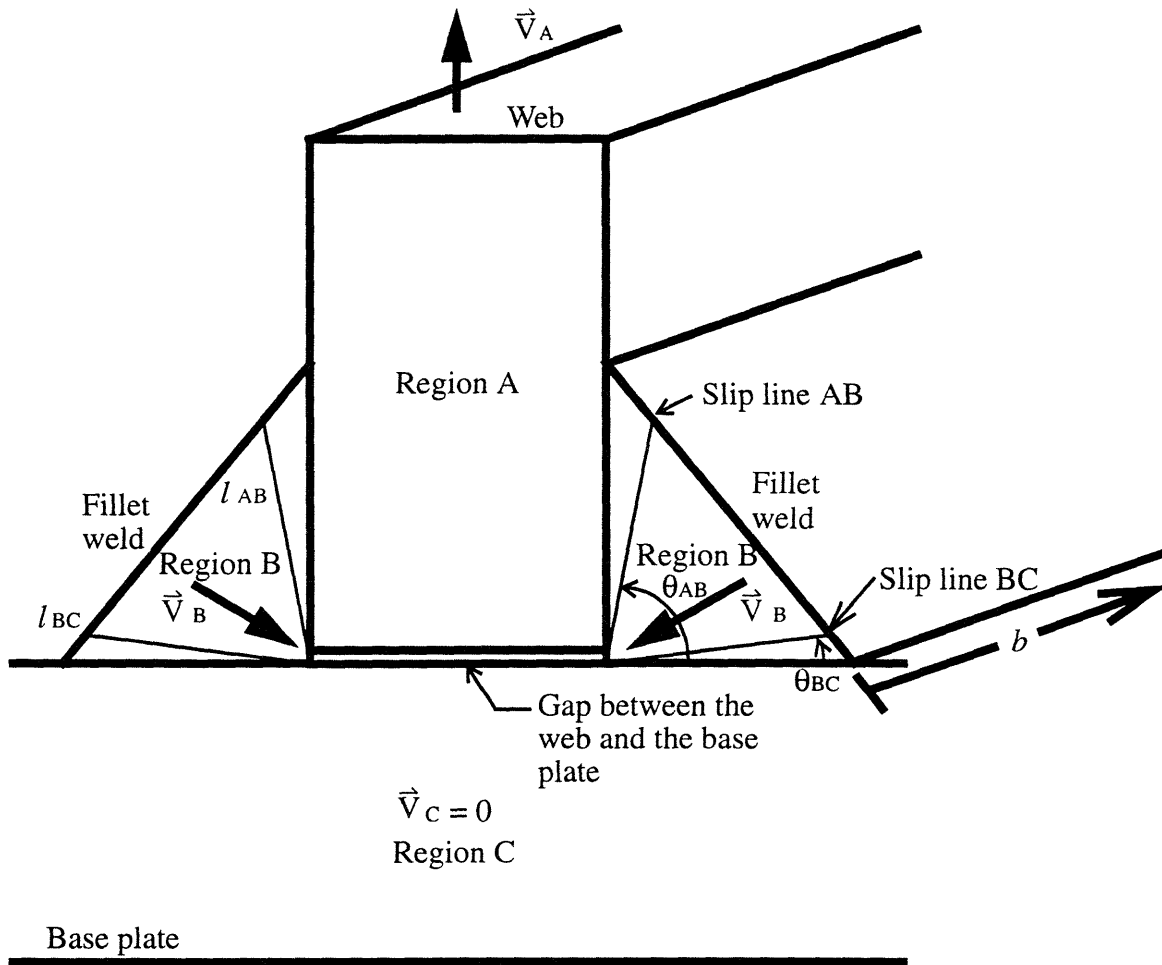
Block-sliding displacement field for tension of a welded T-joint.
